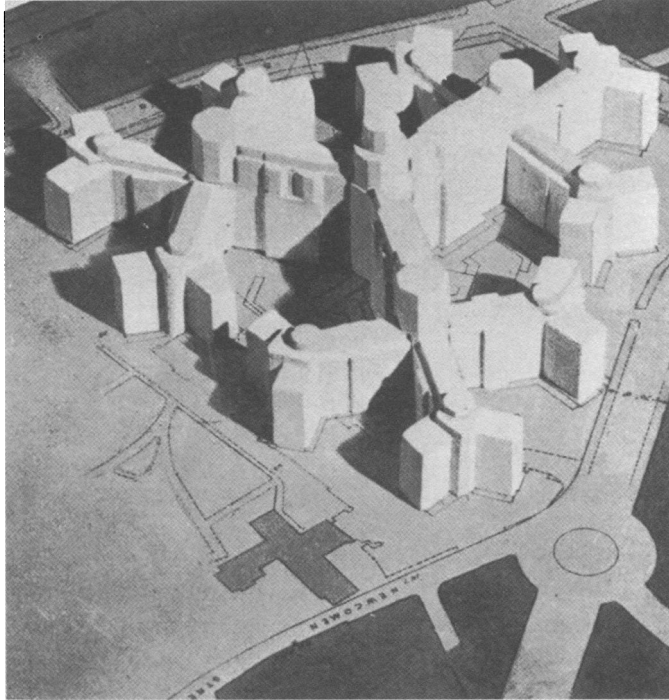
London, Guy's Hospital, "Snowflake" rebuilding scheme, Alner Hall, 1951. Courtesy of King's College London.
